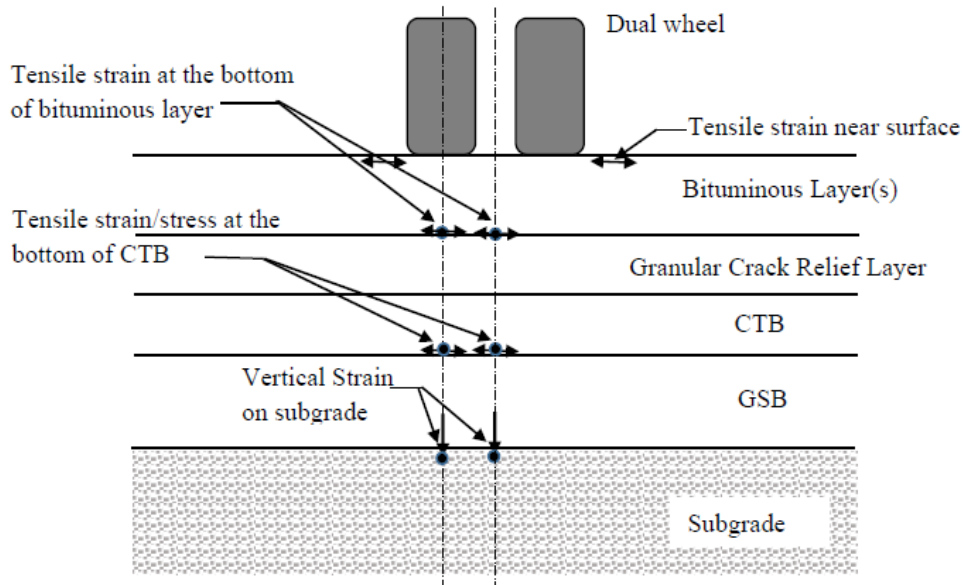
A pavement section with bituminous layers(s), granular crack relief layer, CTB and GSB showing the locations of critical strains. (IRC: 37-2018)
